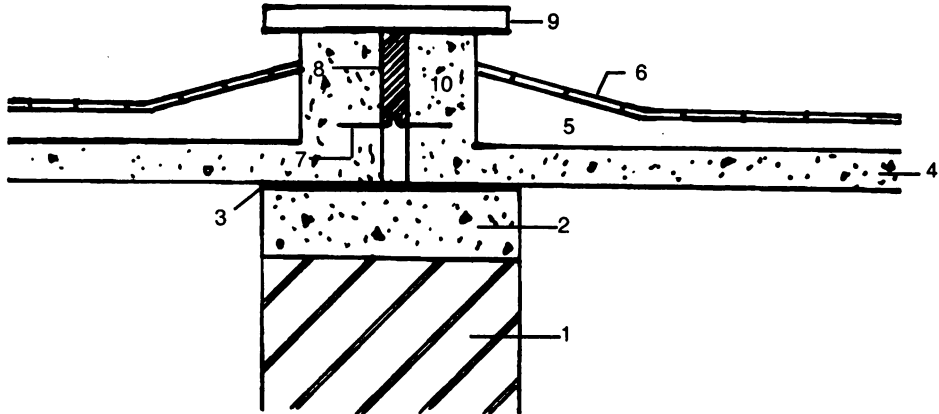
Expansion joint between beams supported on brickout at its ends: 1. Brickwork, 2. Concrete bed block, 3. Kraft paper, 4. Slab, 5. Brickjelly concrete, 6. Membrane waterproofing, 7. Waterstop, 8. Joint filler, 9. Two courses of concrete slab laid breaking joints, 10. Beams.
